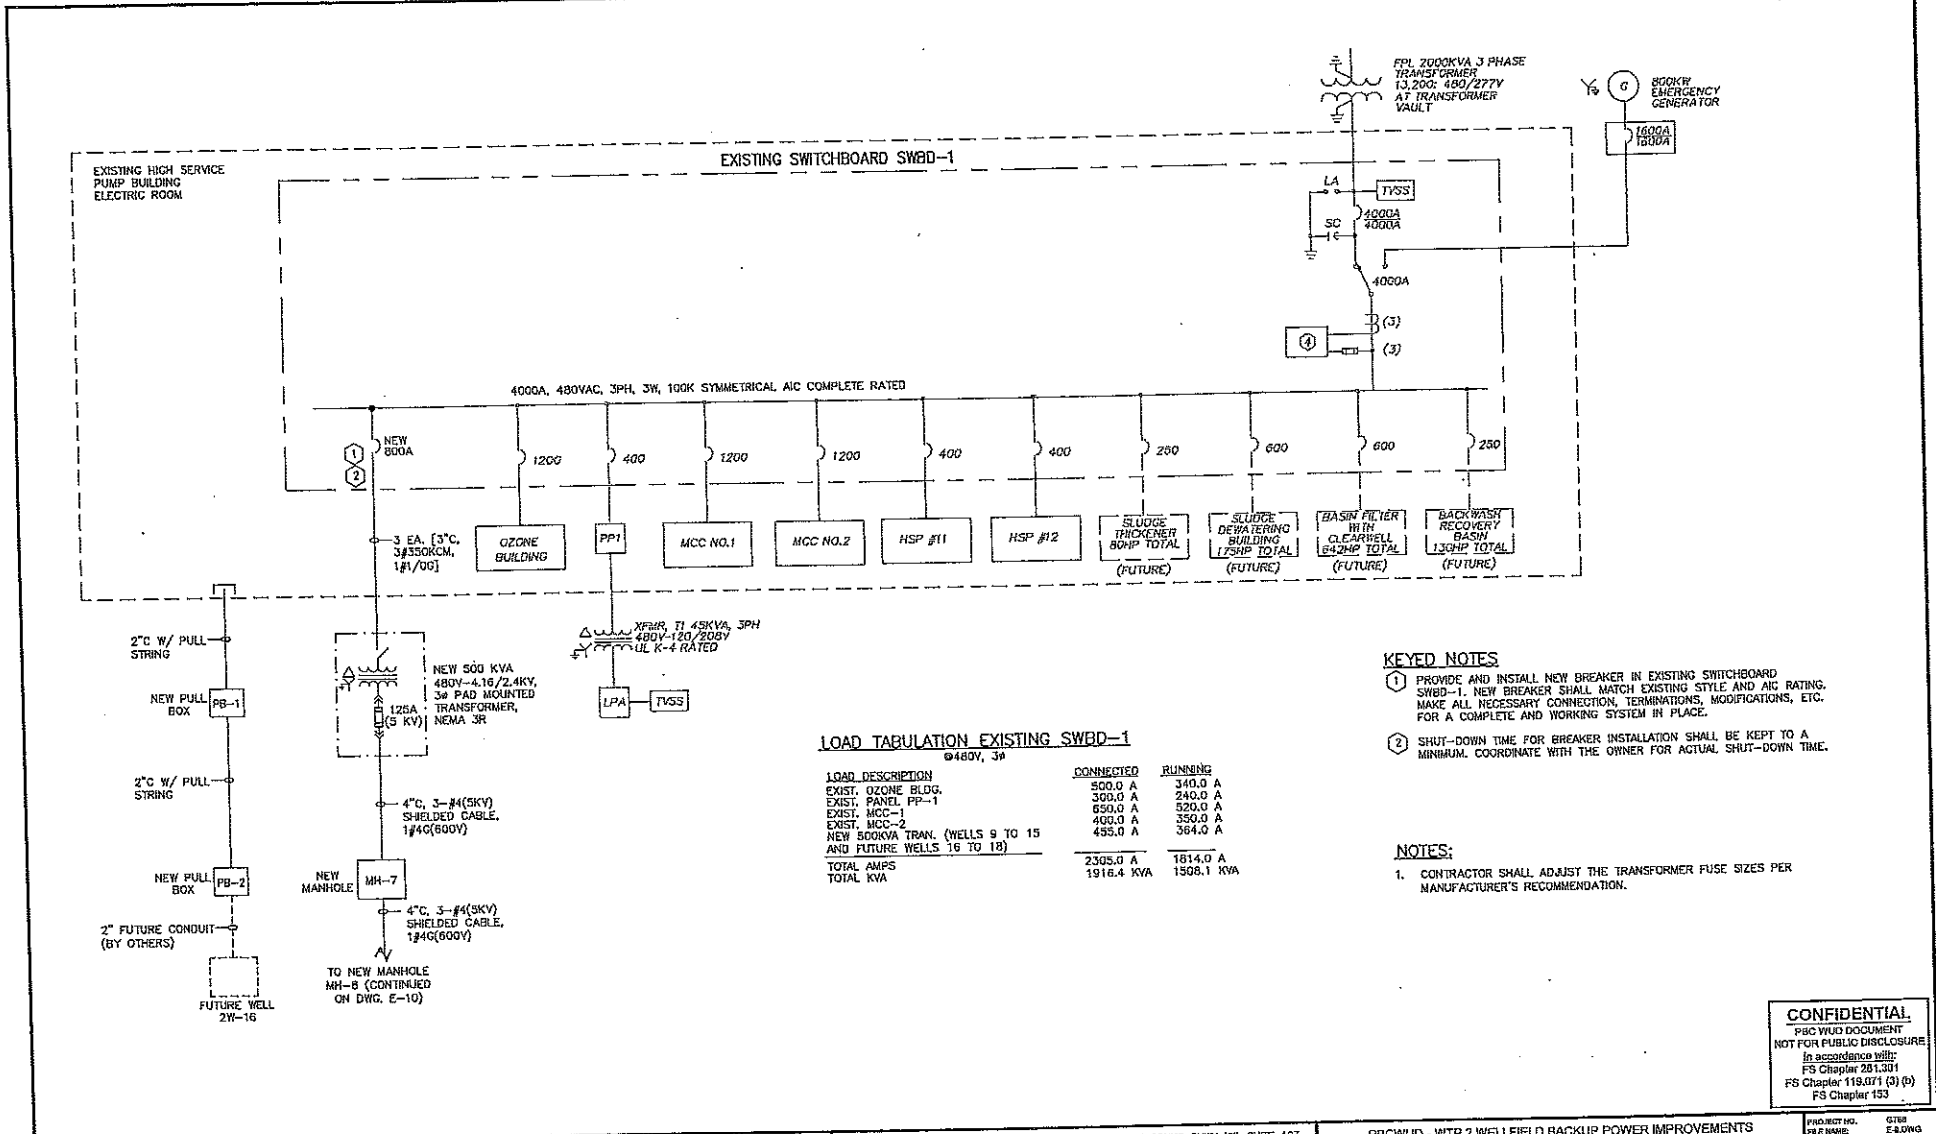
EXISTING SWITCHBOARD SWBD-1 ELEVATION PLAN
